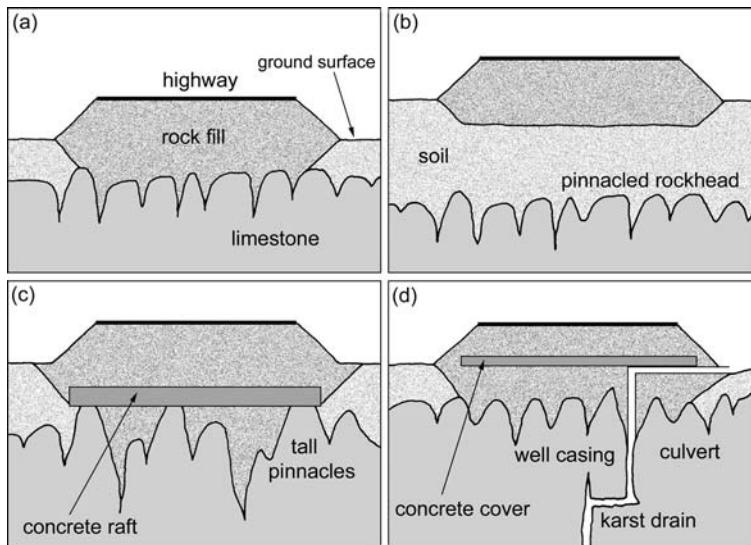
Diagrammatic design concepts (not to scale) for the Shui-Nan Highway: (a) rock fill placed on bedrock where soil is <3 m thick; (b) mattress of rock fill placed on a thick soil cover; (c) concrete raft spanning wide soil-filled hollows between footings on sound bedrock pinnacles; (d) culvert installed to maintain natural drainage into a karst sink.
